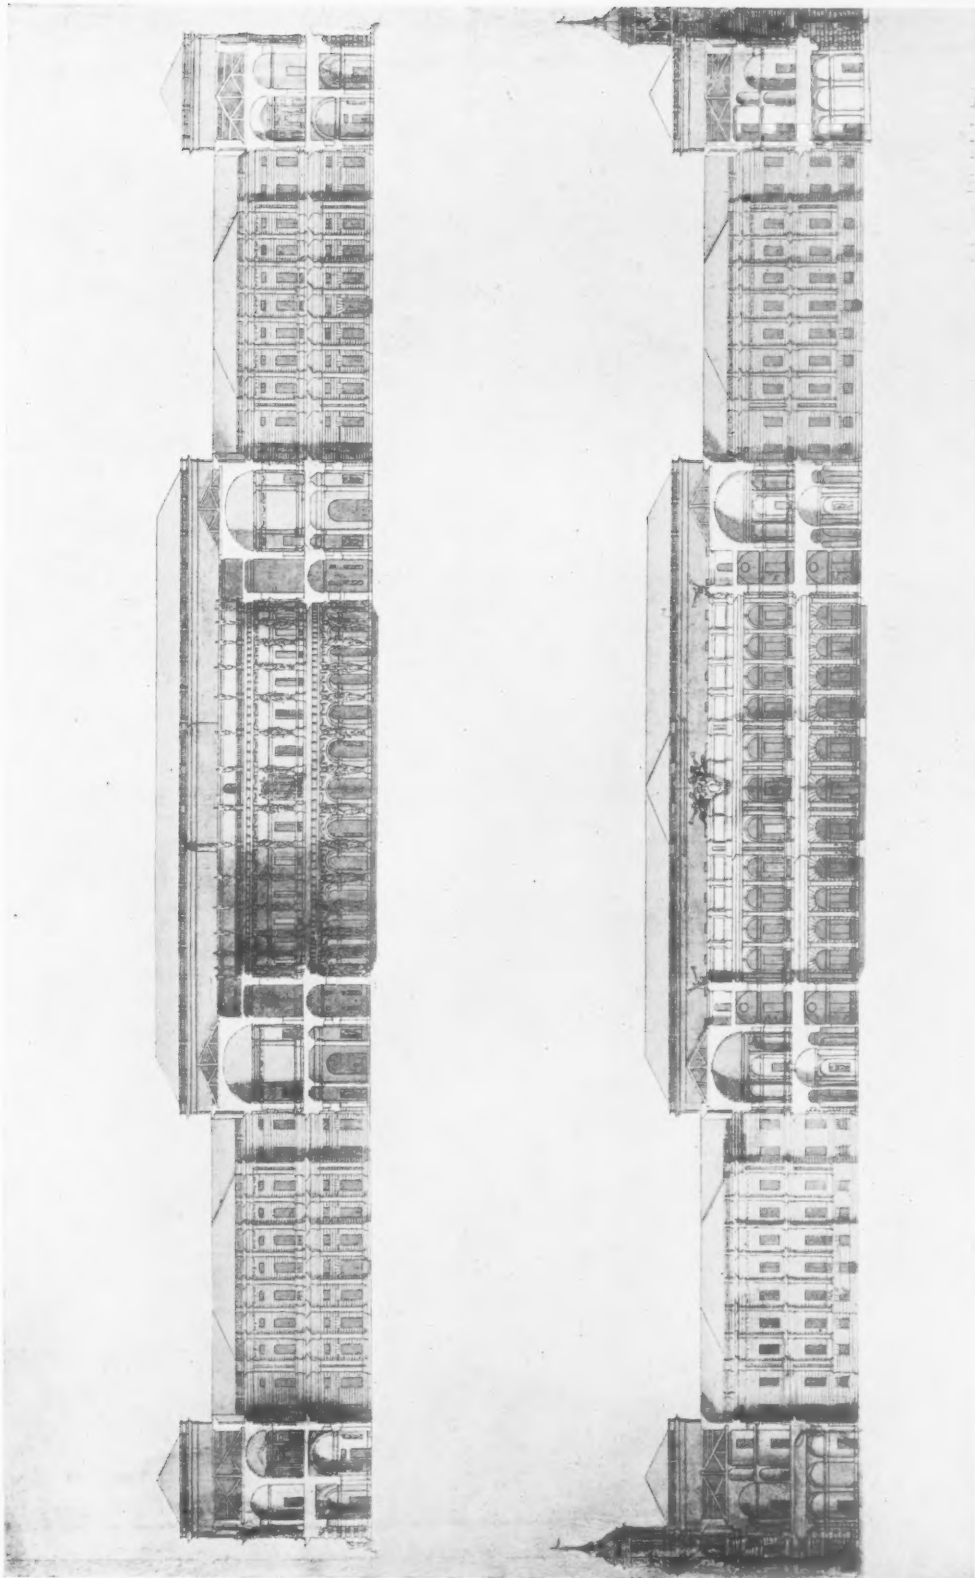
SECTIONS RELATING TO THE PLAN, FIG. 6
